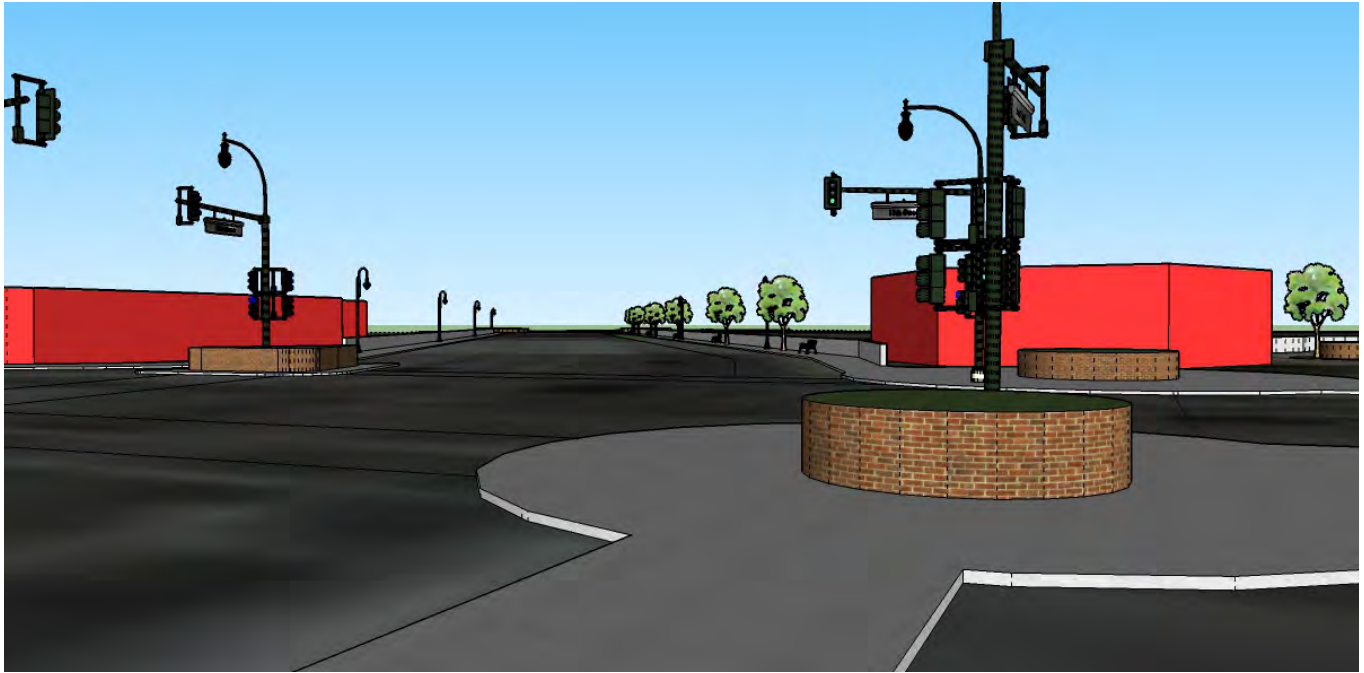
View of the 13th Street and Paso Robles Street intersection.
